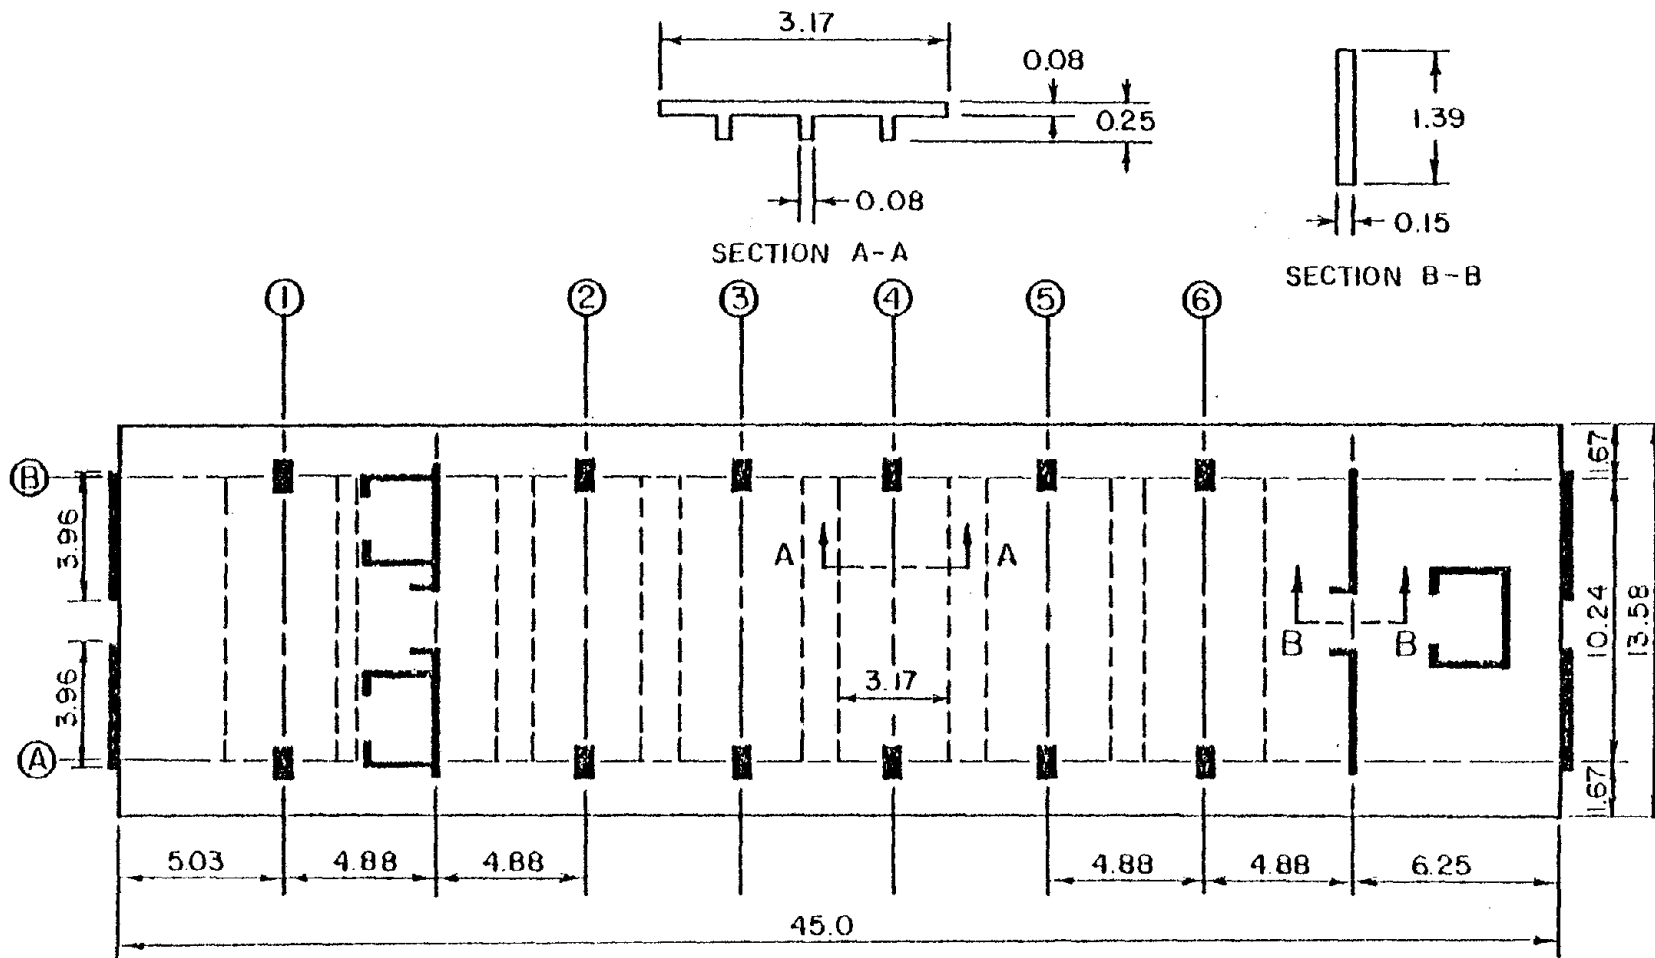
CY, CY1 Structural Idealization for the British Rail Building.
